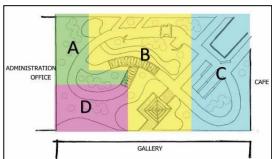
Plan of the sensory garden at BCA Academy, Singapore. Zone A (smell), Zone B (sound),
